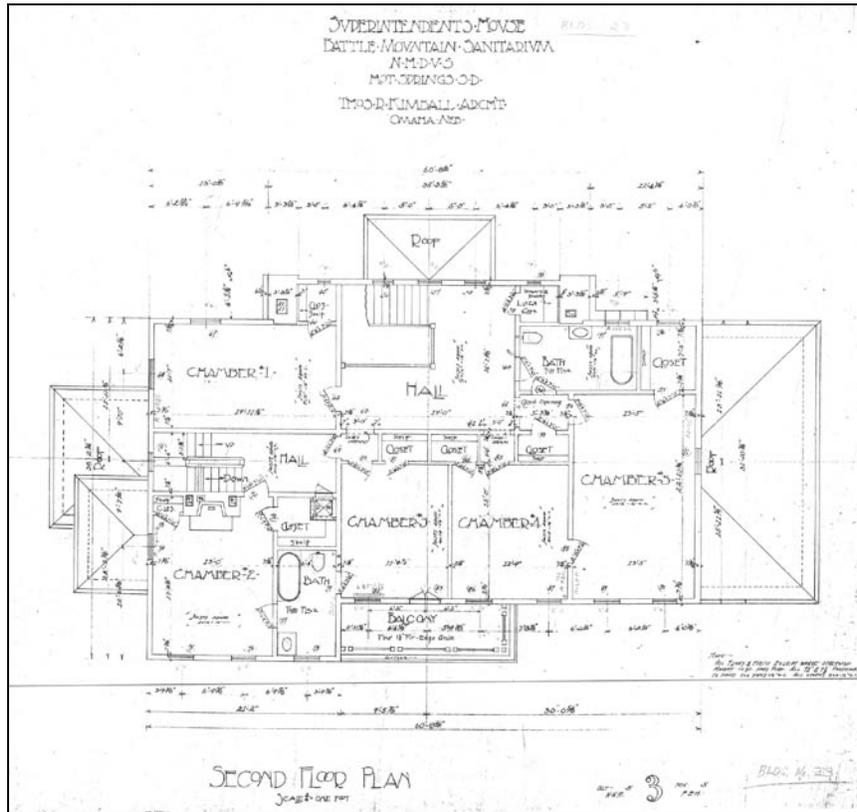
Thomas Rogers Kimball, Second Floor Plan, "Superintendent's House," (October 1905)
